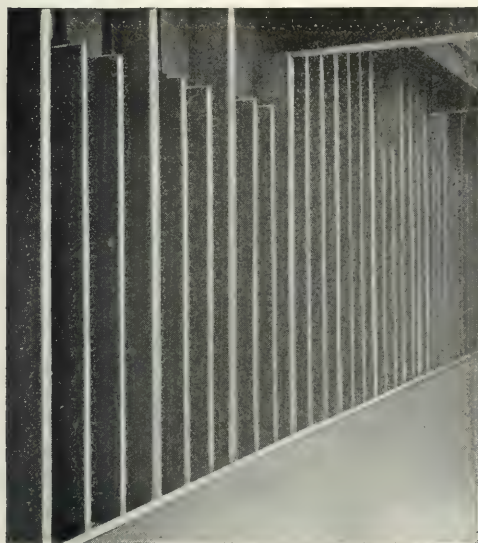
REAR OF CONCRETE SWITCHBOARD STRUCTURE SHOWING VERTICAL BARRIERS
